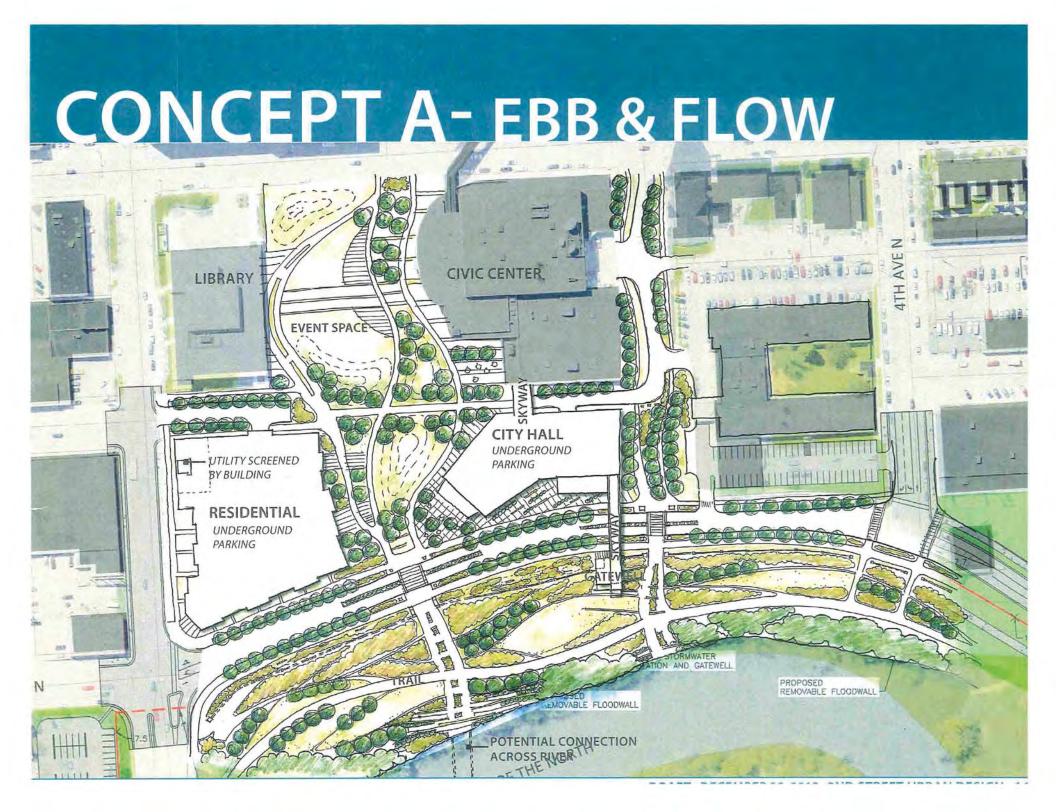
Conceptual Site Plan of Stormwater Infrastructure and Park Space at Proposed Riverfront Plaza
